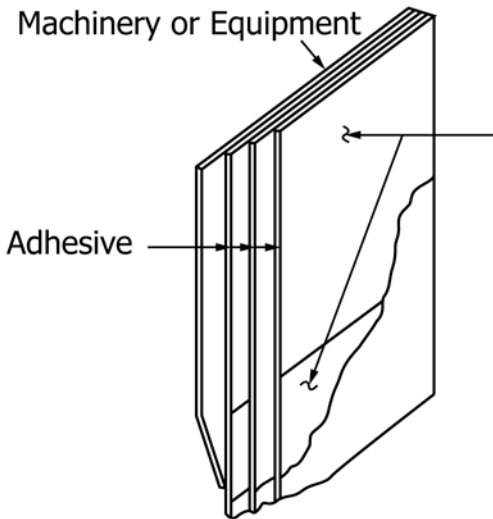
Installation of Polyimide Foam Insulation (Specification C1482, Type I) on Machinery and Equipment
